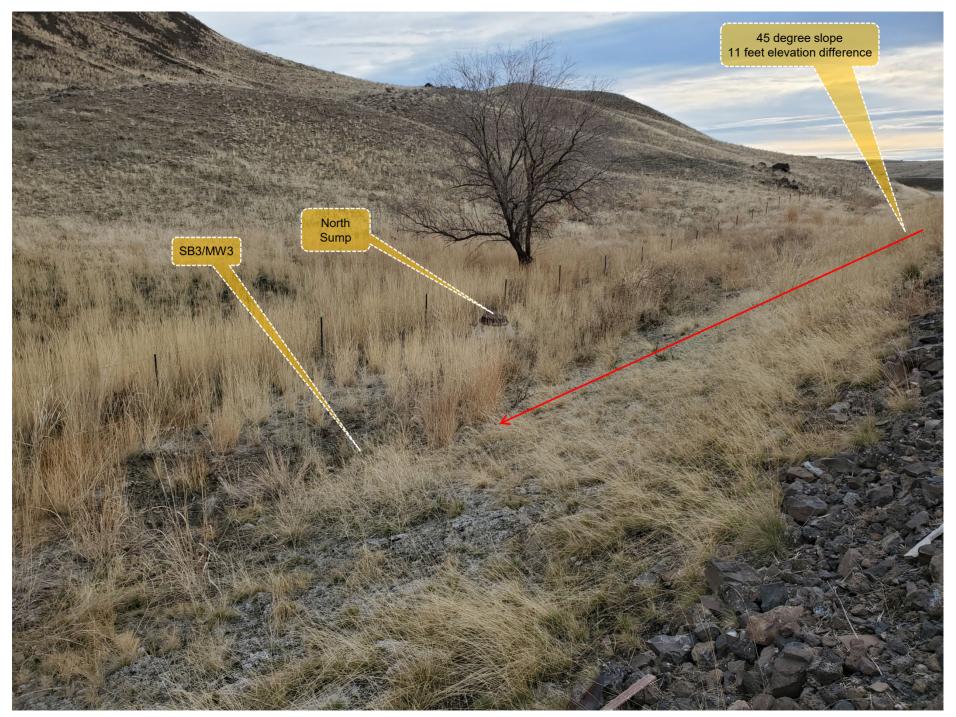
Highway embankment sloping to SB3/MW3 location.
